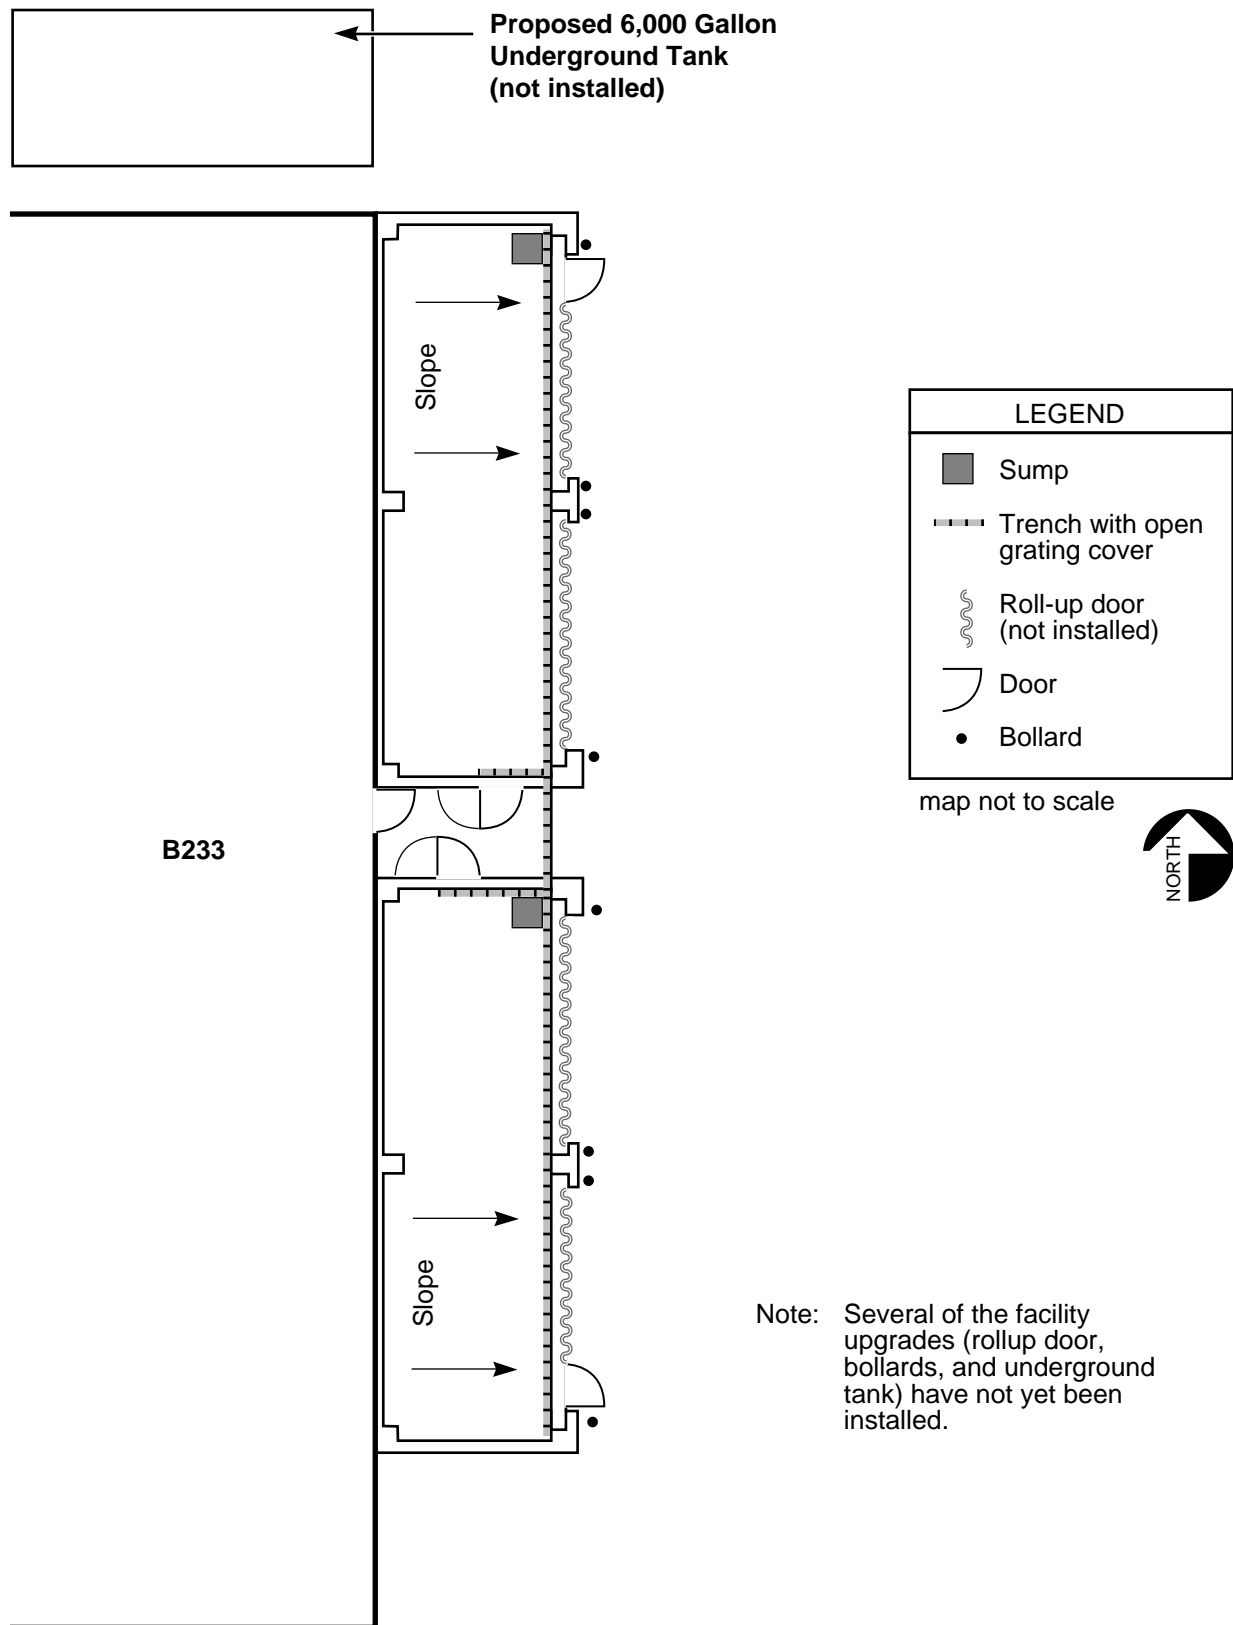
Building 233 Container Storage Unit on the East side of Building 233
